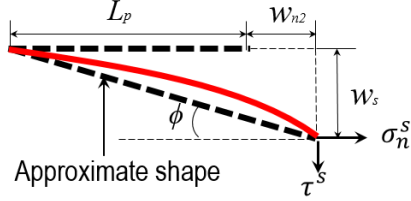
Normal and shear deformation of longitudinal reinforcement.
